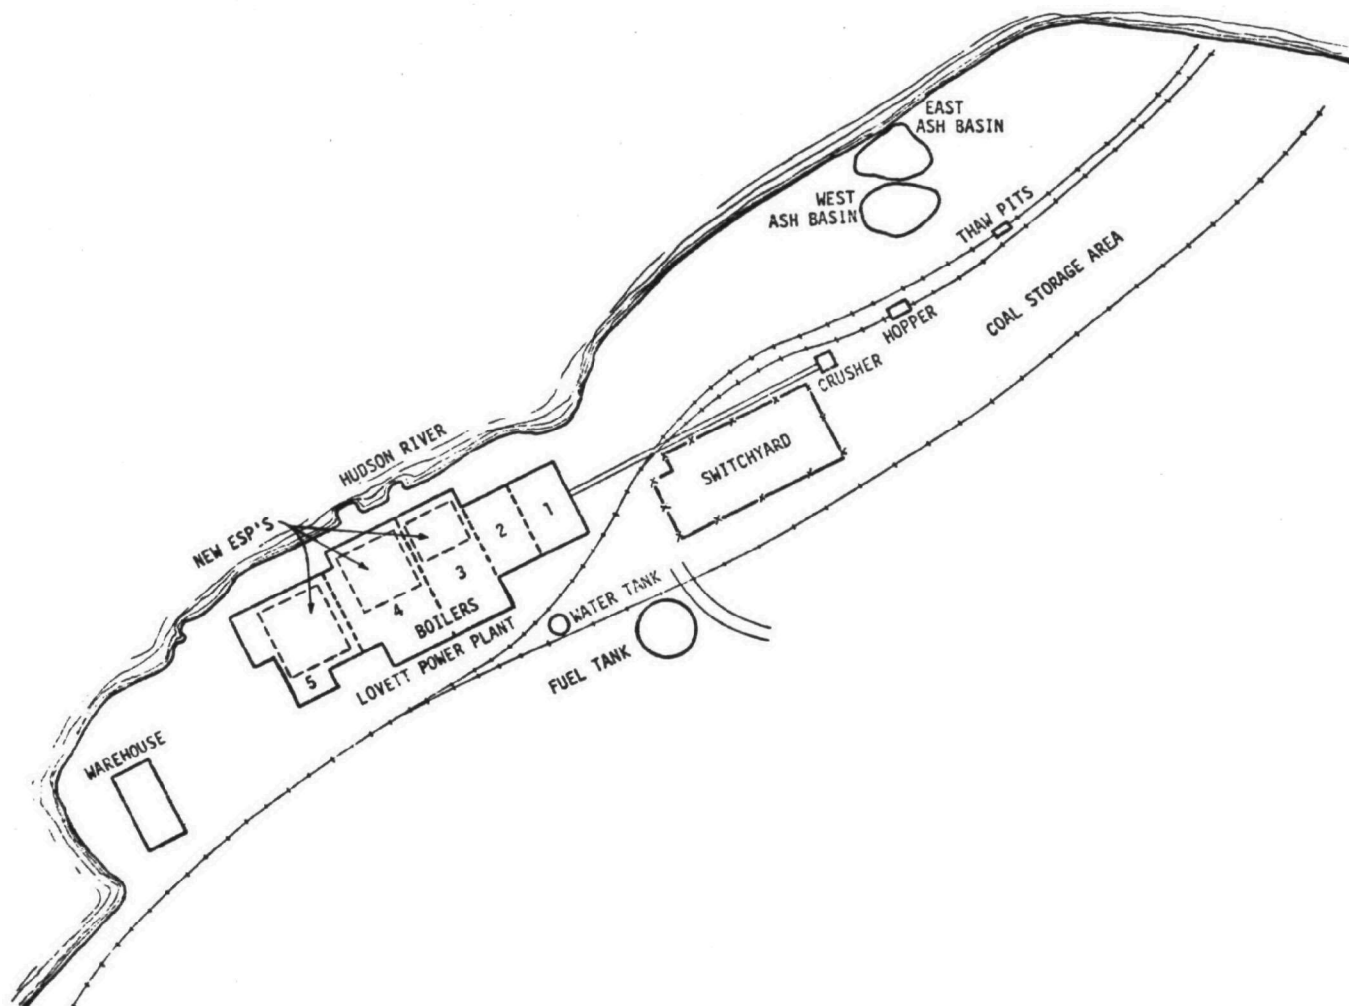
Site plan showing possible locations of new ESP's for Boilers 3, 4, and 5 at the Lovett power plant.
